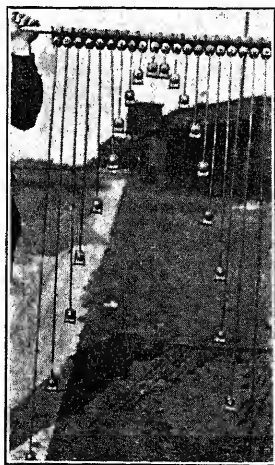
COMPLETE SPAN OF HANGERS ASSEMBLED ON PIPE
